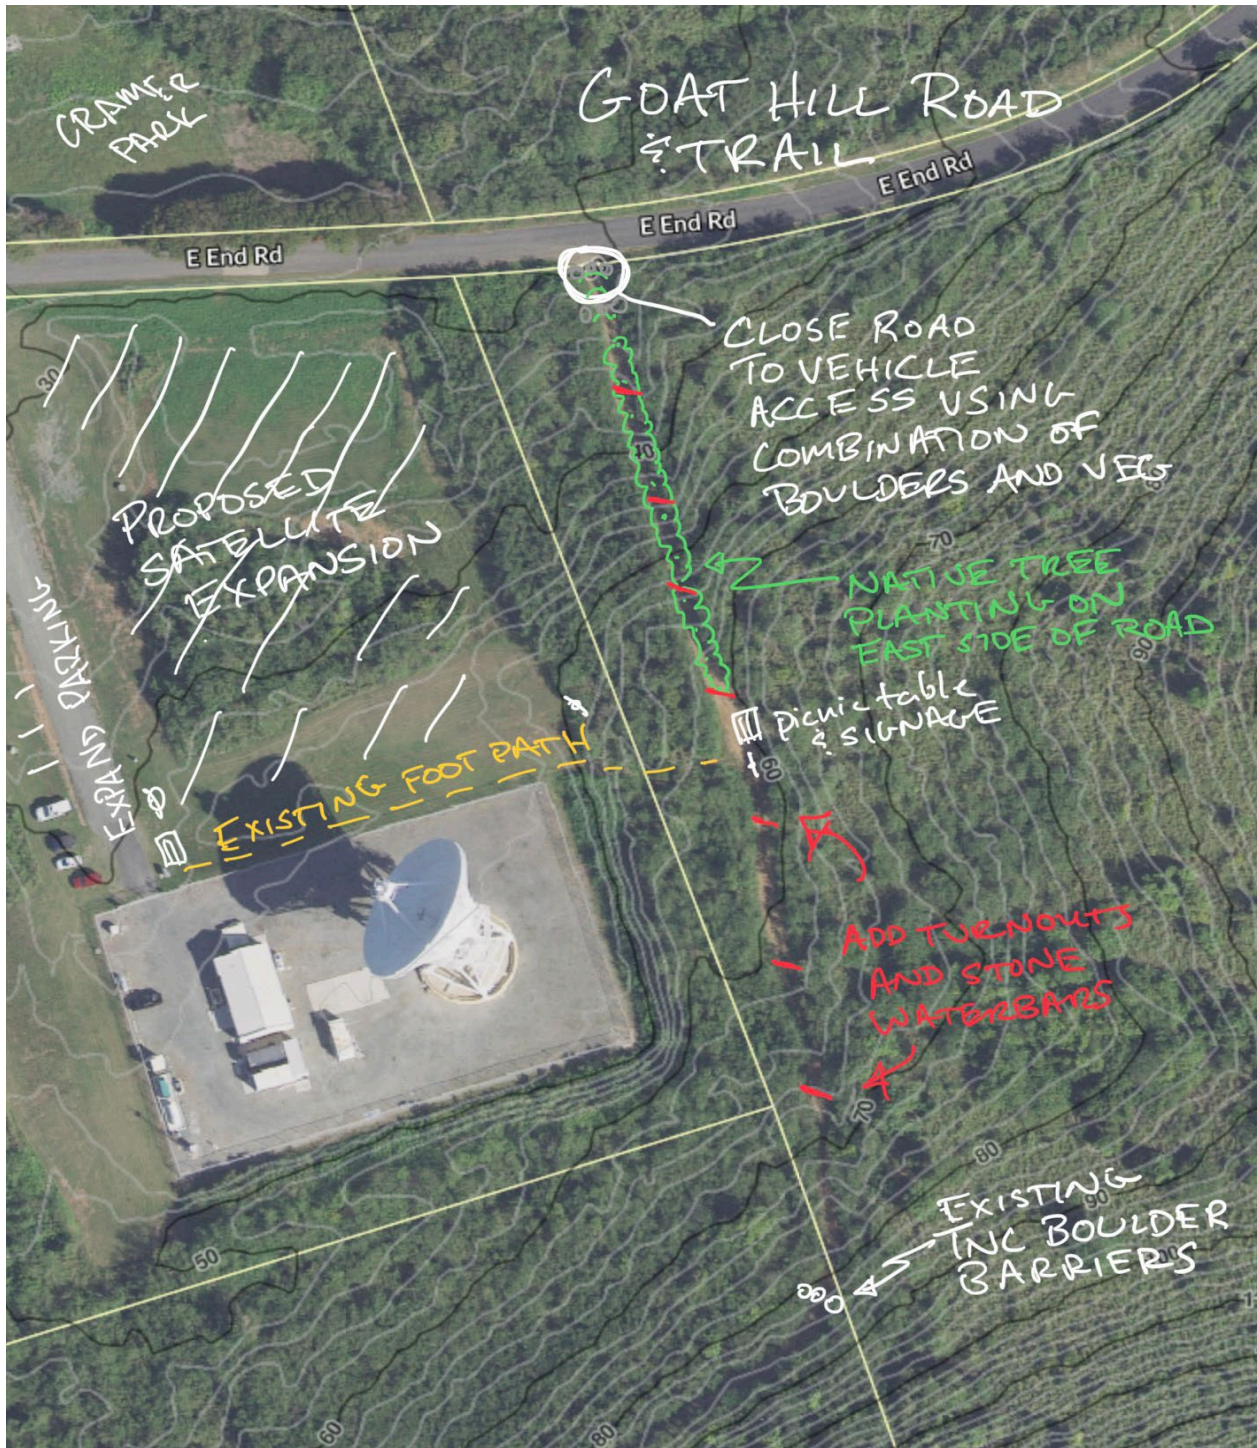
Conceptual sketch of improvements to Goat Hill Rd, which provides access to the TNC managed trail.
